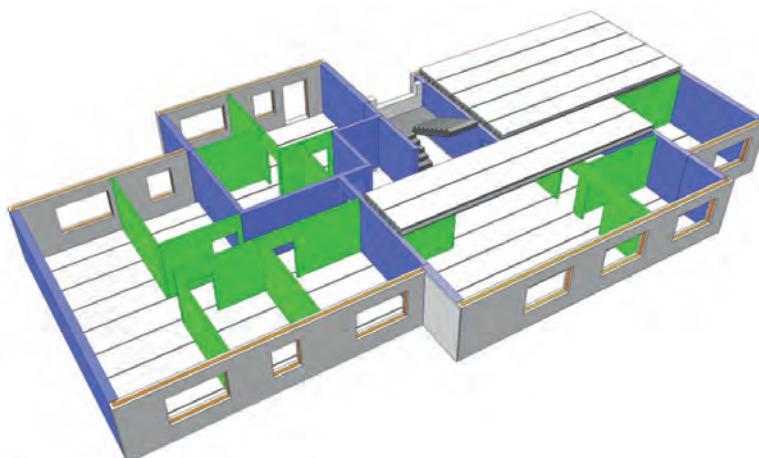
Apartment building with load-bearing cross-walls and large floor spans
